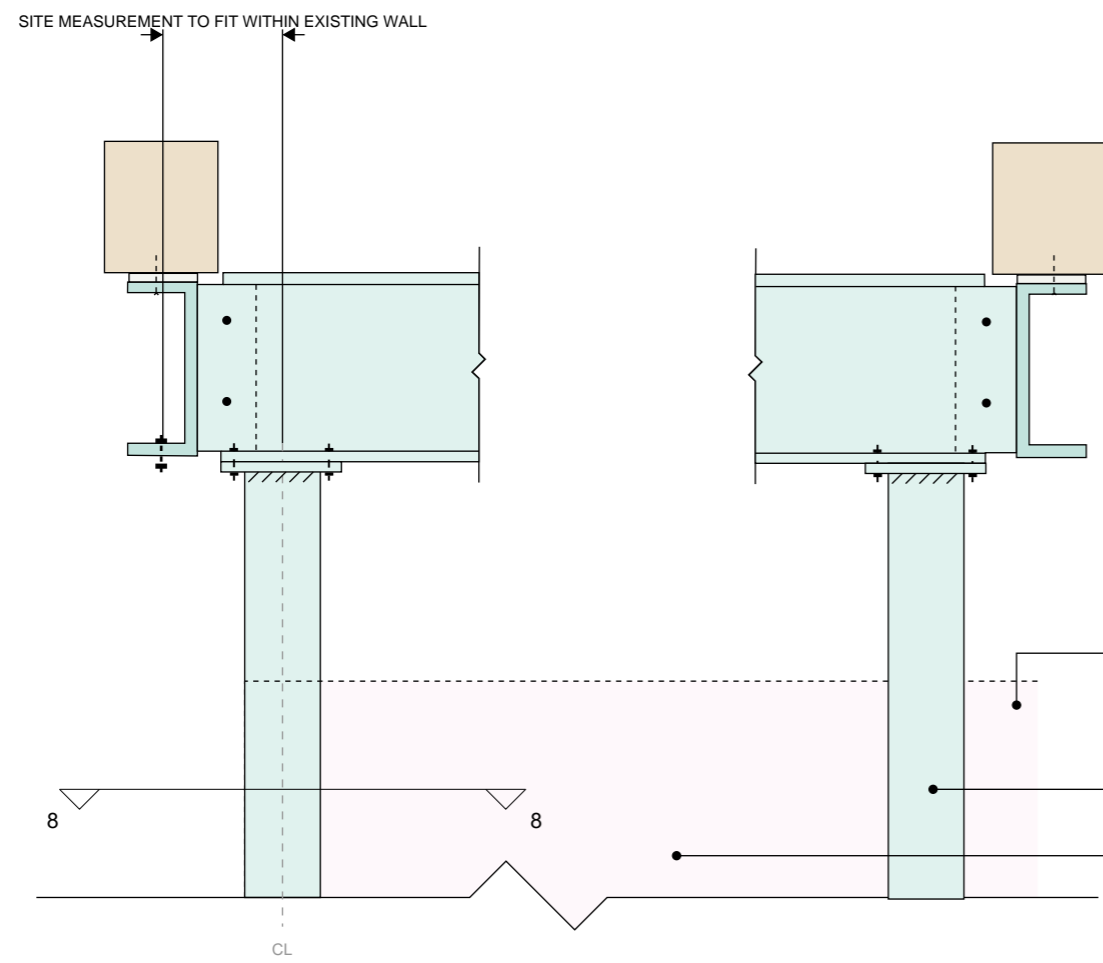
ROOF 5 TO 6 PURLIN JUNCTION
